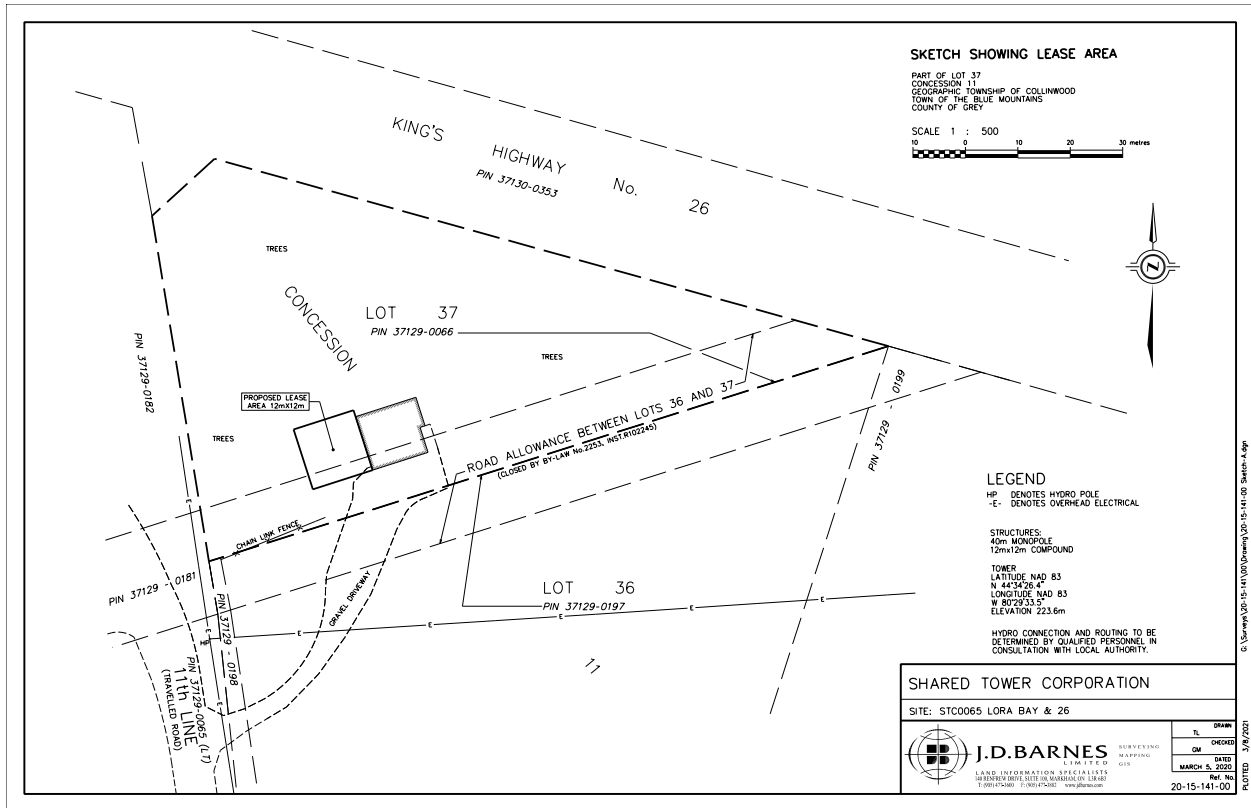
Plan Survey of Proposed Tower Location (see enclosed print-out for clearer detail)
